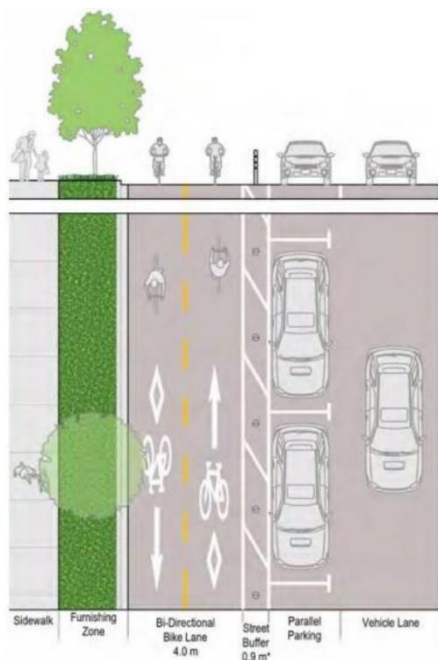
// Bi-DIRECTIONAL PROTECTED BICYCLE LANE CROSS-SECTION WITH ON-STREET PARKING (DESIRED WIDTH)
